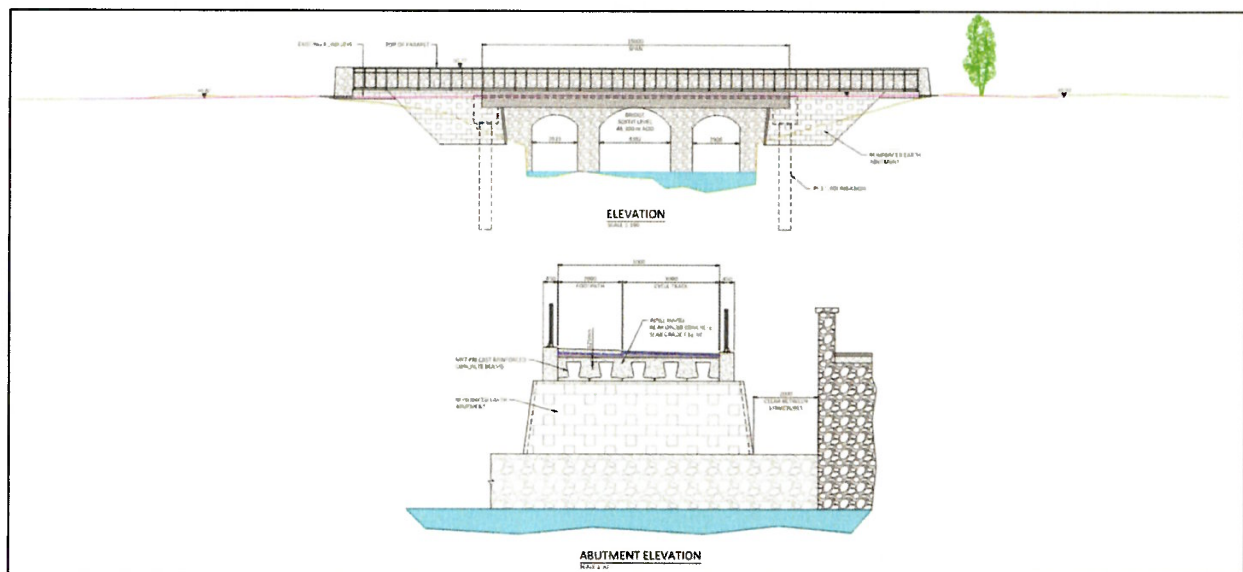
Pedestrian Bridge 2 Cross-Section and Elevation
